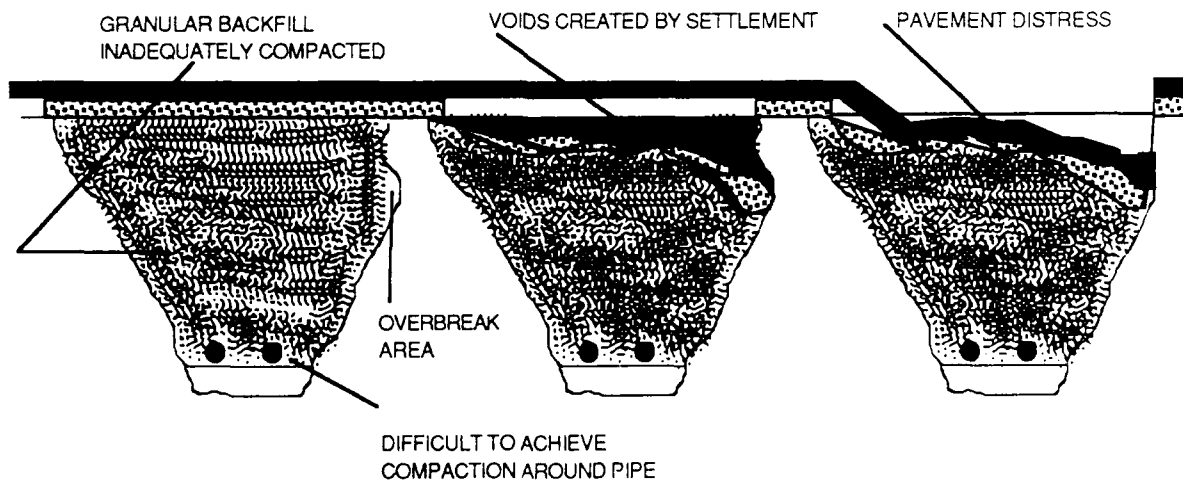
Inadequately Compacted Fill Leads to Damaged Pavement
